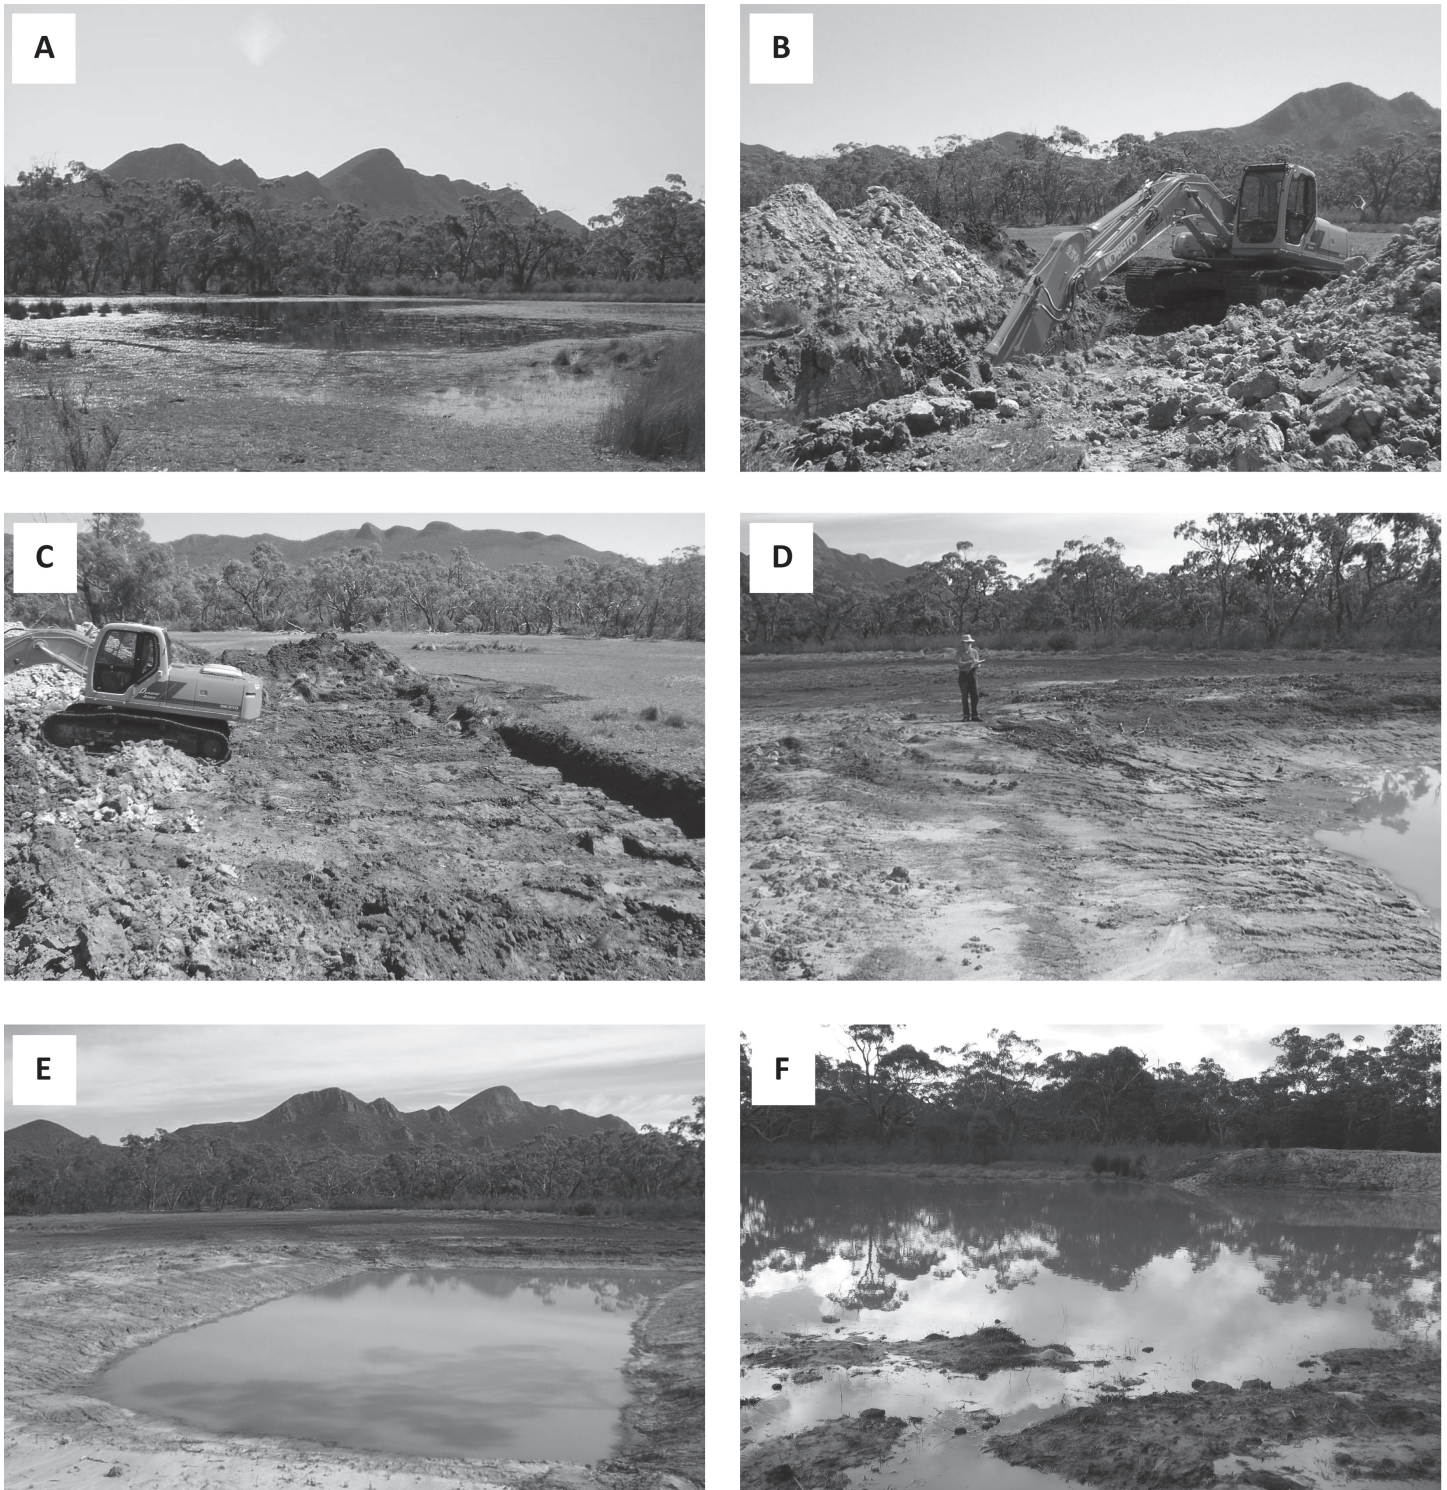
Photographs of site WFW1 before and after fire dam construction. A, an intact WFW1 before fire dam construction; B, photo showing the WFW1 wetland being excavated to enlarge the existing adjacent fire dam; C-D, photos showing the extent of WFW1 excavations into the peat layer and the piling up, spreading out and compaction of excavated sediments onto unexcavated part of the wetland; E, the completed fire dam; F, completed fire dam and connected wetland upon first filling by precipitation – note the turbidity of the water and the absence of any aquatic vegetation.
